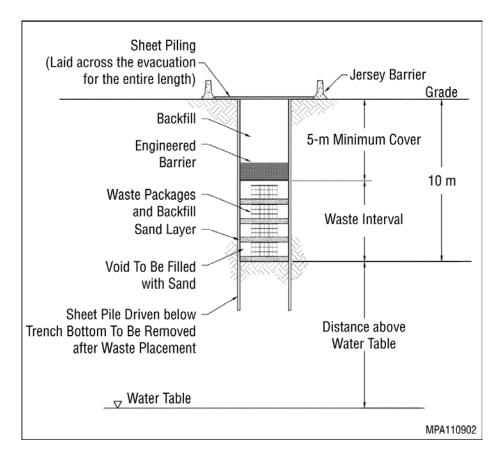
Cross Section of a Conceptual Trench Disposal Unit
